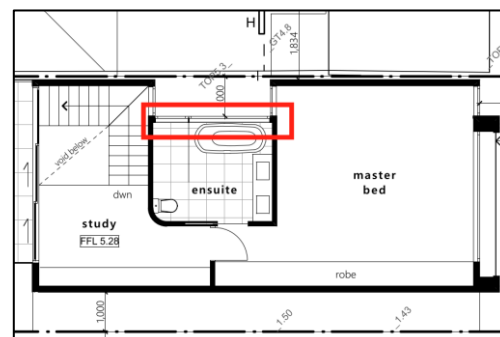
Excerpt from endorsed ground floor plan for 3 Lytton Street, markup showing ensuite window
